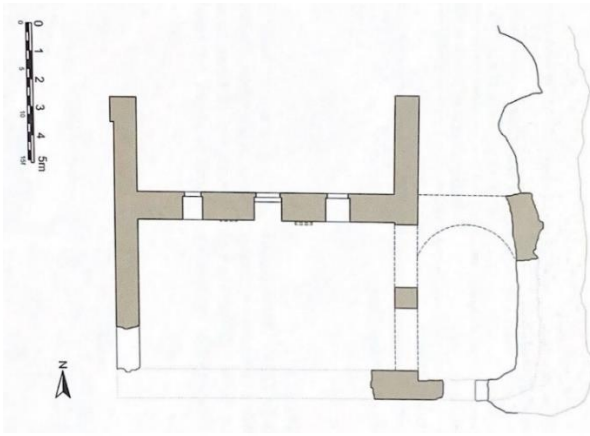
Plan of Kindik Church (EACHAR, 2018)
